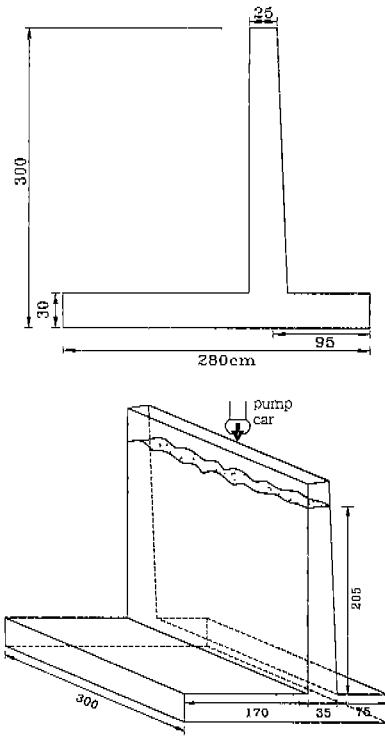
Retaining wall specimen for testing compactability and formwork pressure
